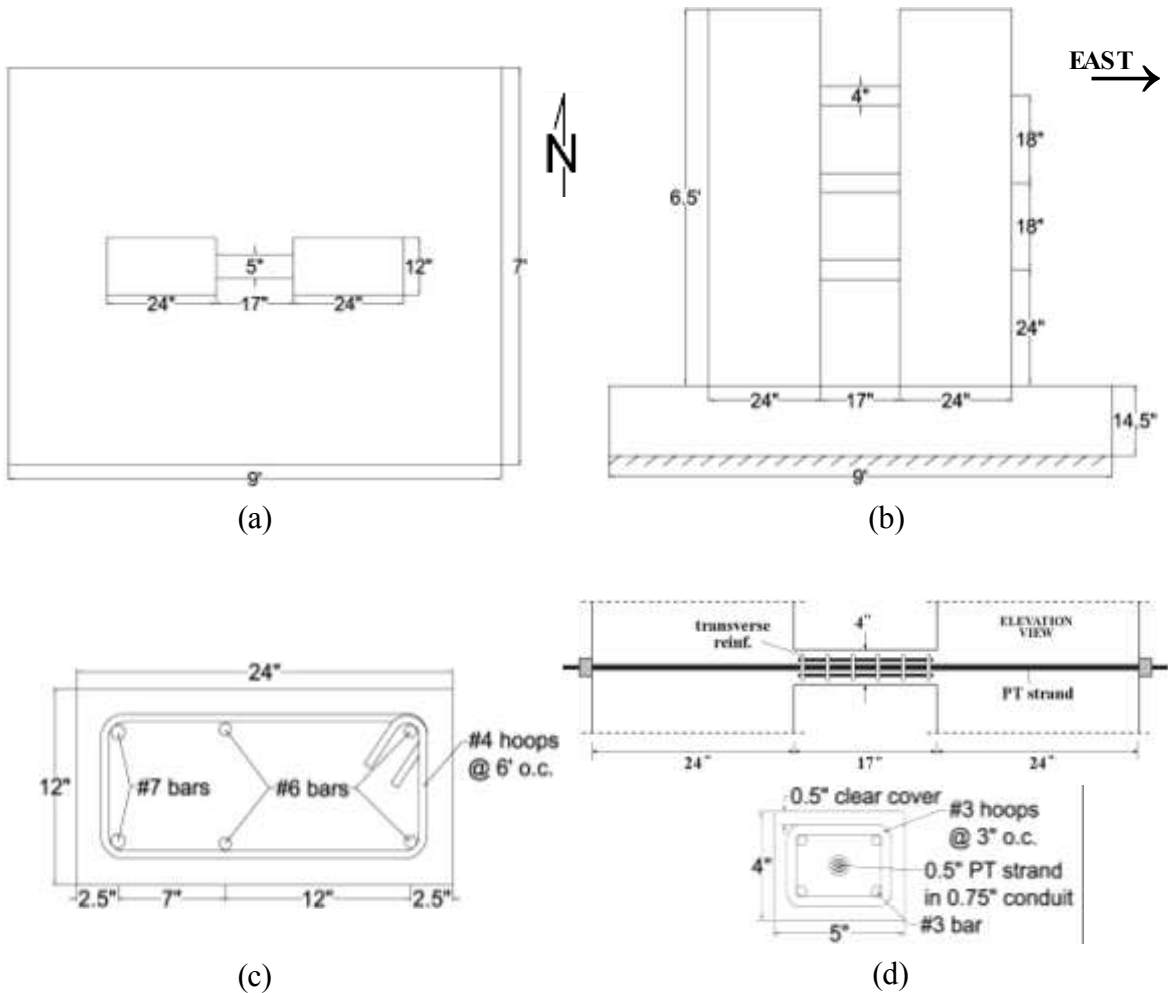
UT Tyler Specimen: (a) specimen plan; (b) specimen elevation (Looking North); (c) wall pier details; (d) coupling beam details
